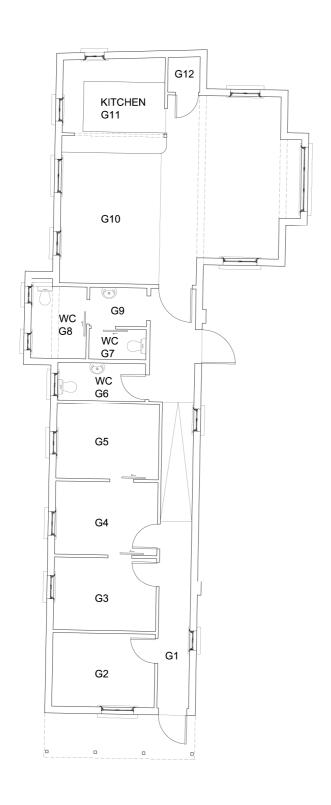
Tom O'Neill Centre, ground floor plan, not to scale Source: Tanner Architects 2010.
